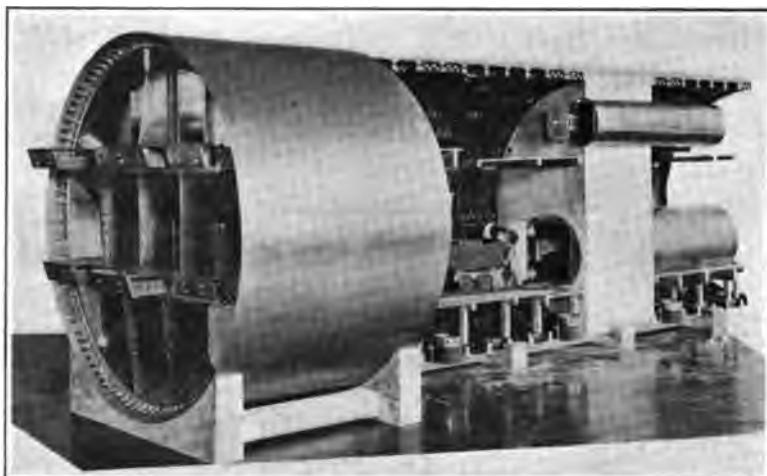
Sectional view of model of compressed air tunnel (A-18) looking toward face of shield. (Courtesy of Pennsylvania Railroad.)
